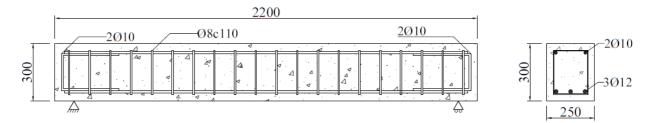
Dimension and reinforcement details of beam (All dimensions are given in millimeters)
